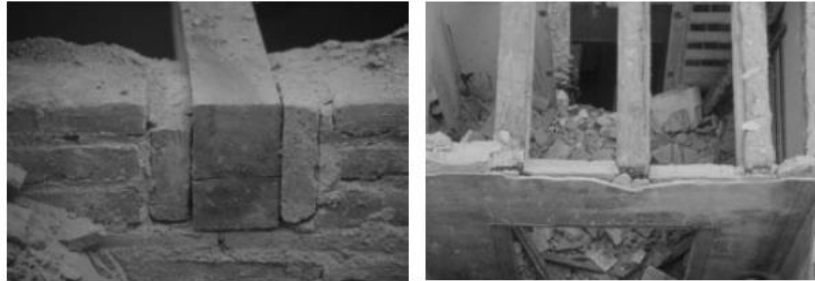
Simple supports of timber floor beams between two bricks on the load-bearing unreinforced masonry wall (Paricio Casademunt, 2001).
